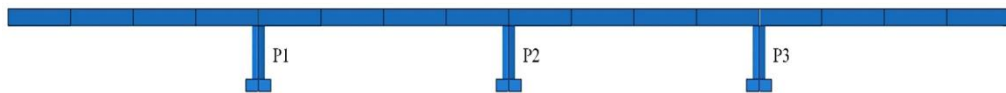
Elevation view of four-span RC continuous bridge (Not to scale)
